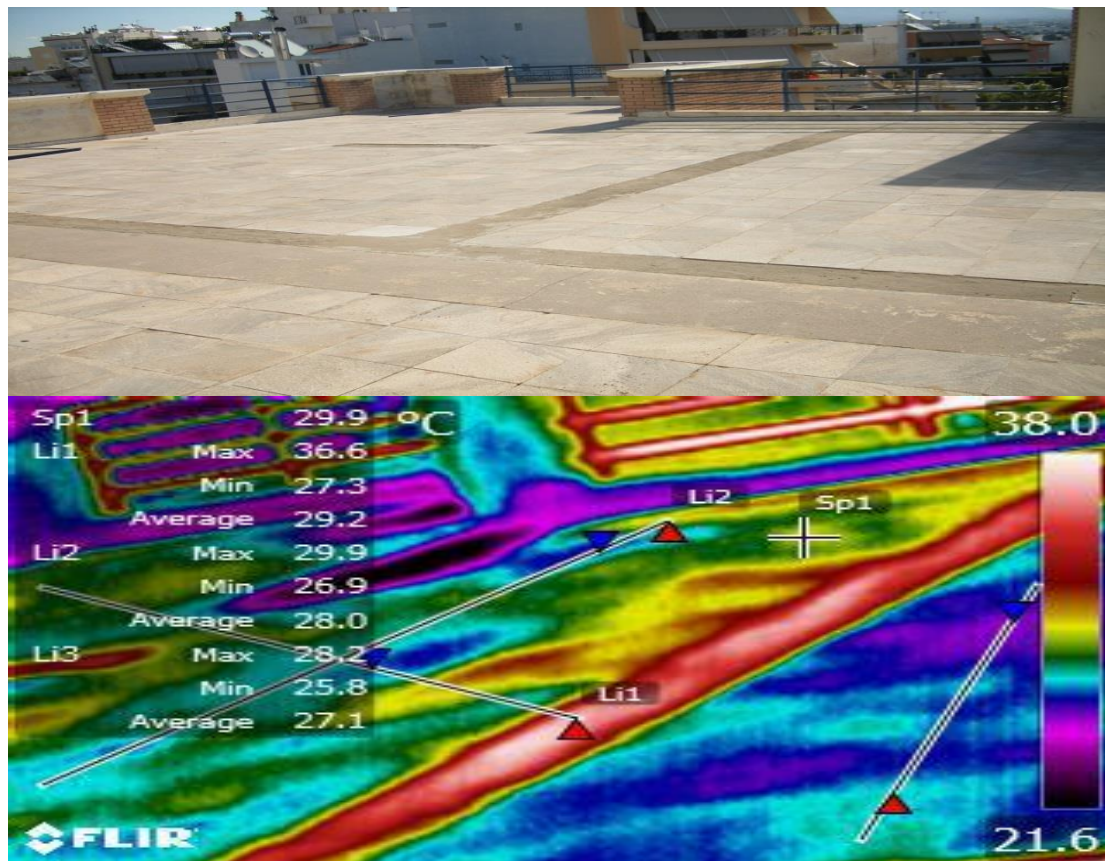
Thermal and visual photo of 3rd floor's roof tiles
